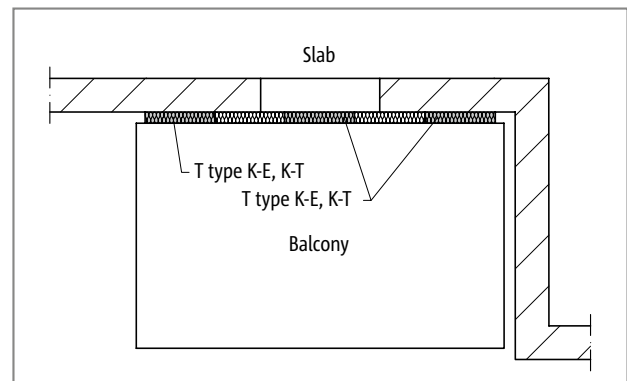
Schöck Isokorb® T type K-E, K-T: Balcony with façade offset
